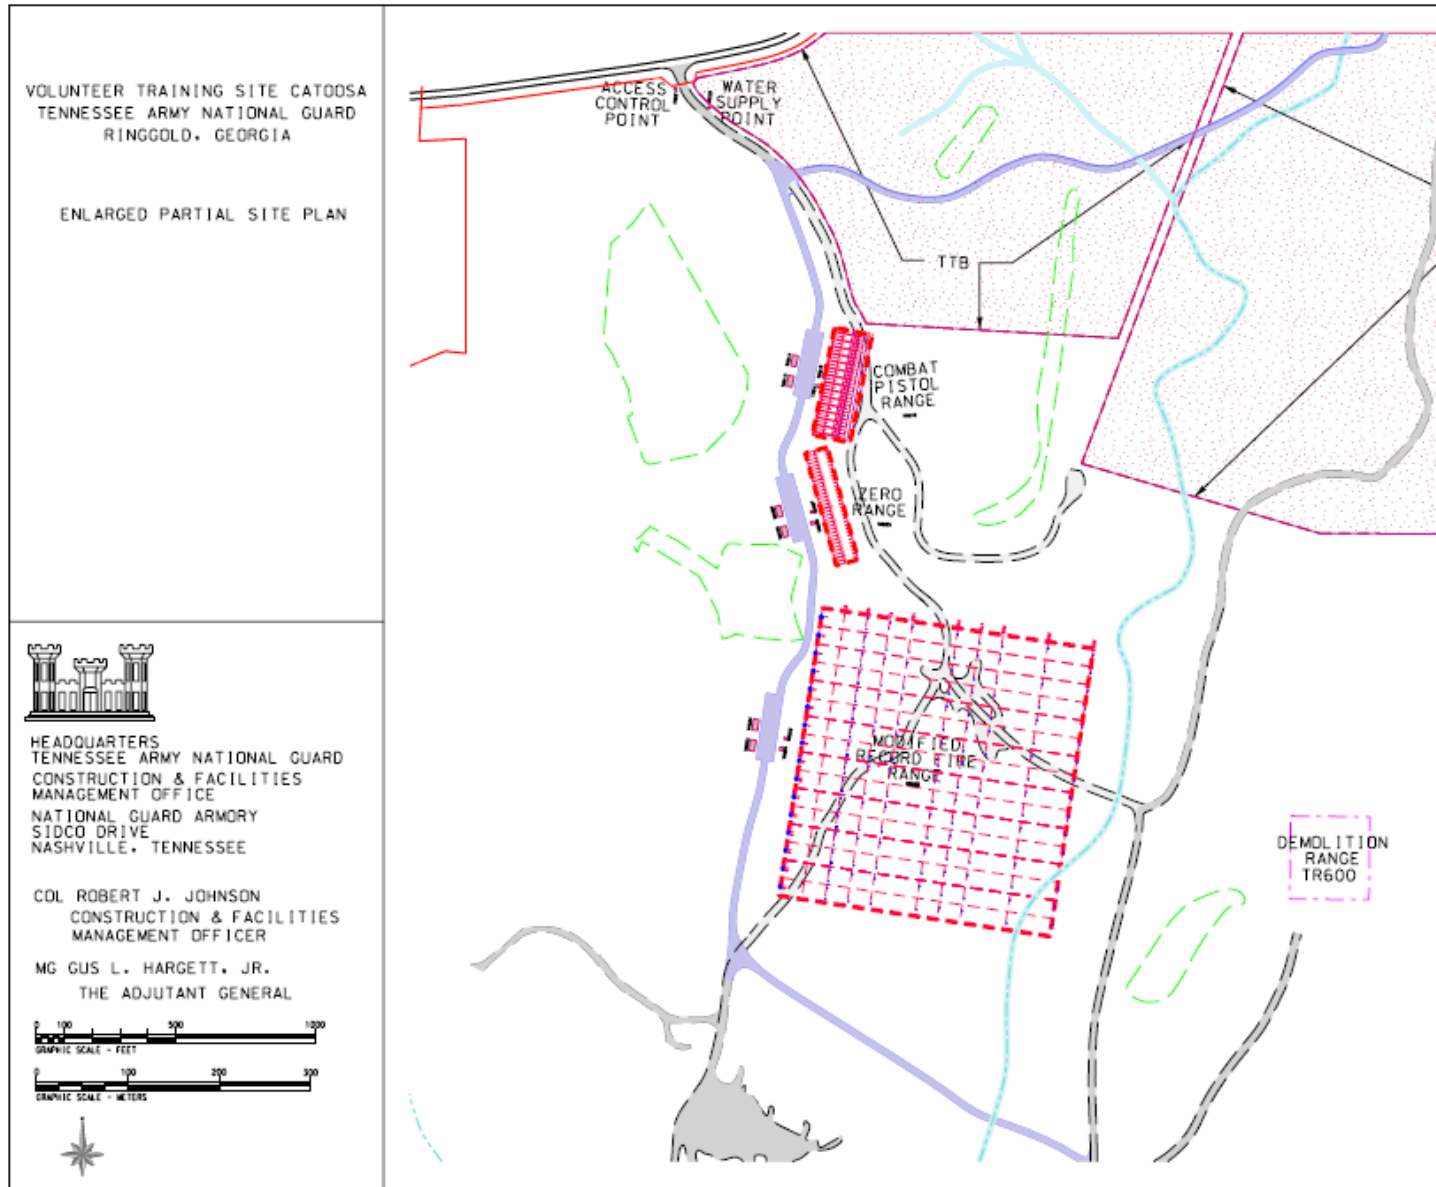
Proposed ranges and associated construction for the VTS-Catoosa. — indicates new road construction.
